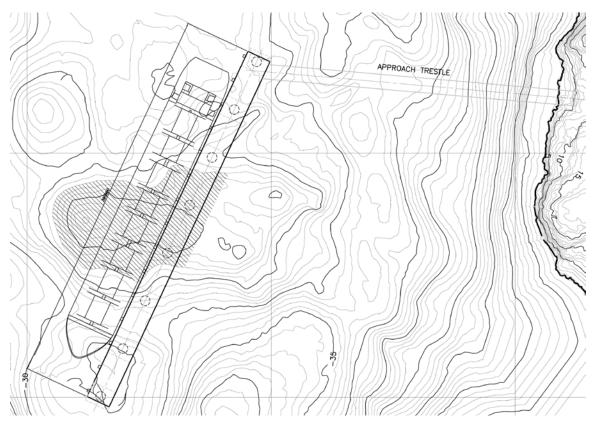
Plan, Option 2 for Steensby Island Bridge (see Appendix A)
